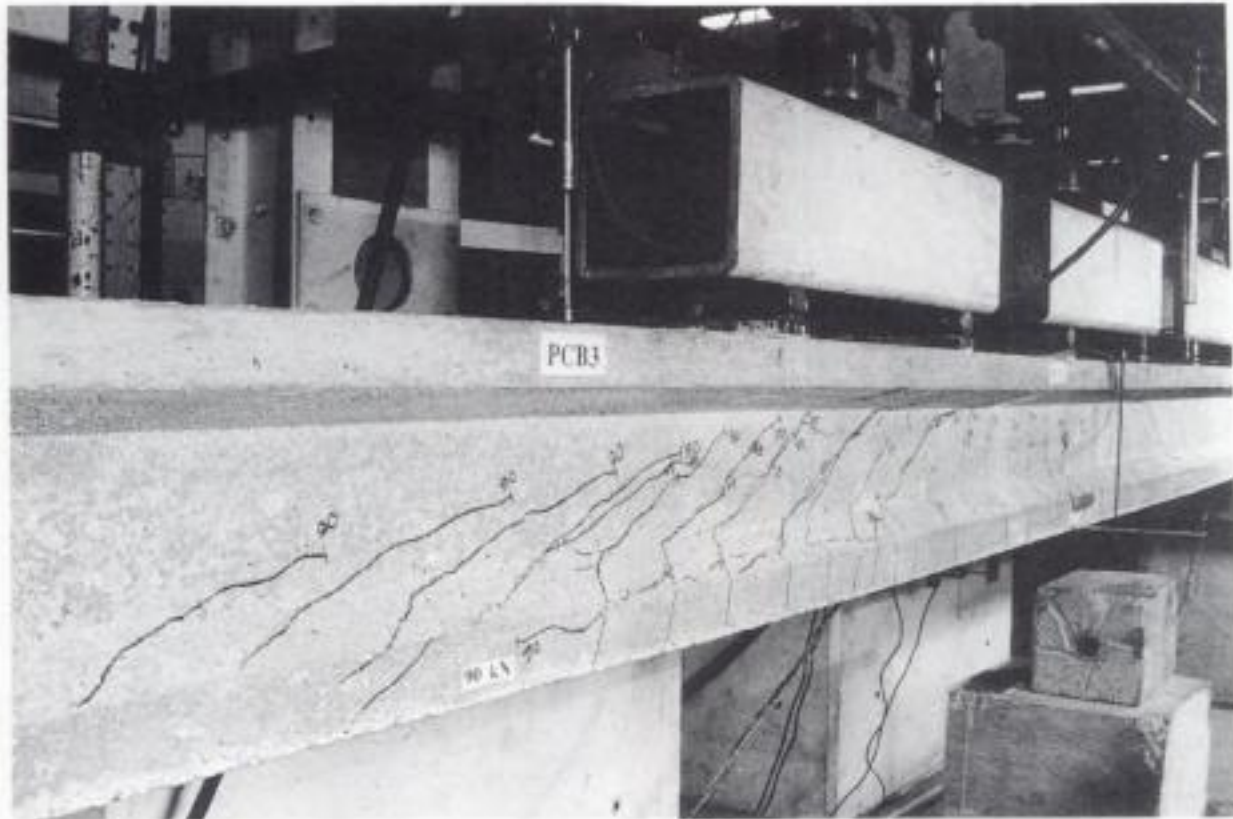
Beam PCB3. Crack pattern at failure¹⁸²
